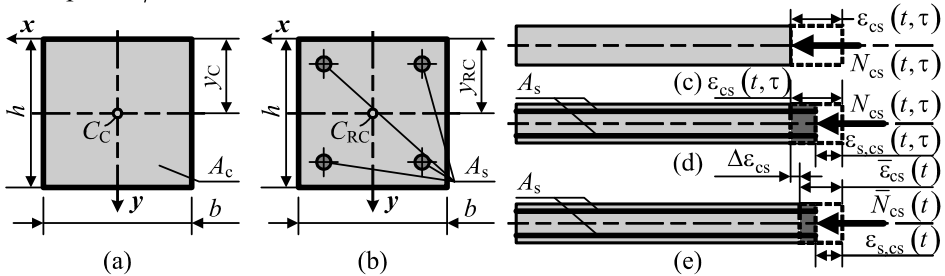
Deformations of symmetrically reinforced concrete member due to shrinkage: plain concrete section (a); reinforced section (b); modelling of free shrinkage deformation (c); deformations due to restrained shrinkage neglecting and taking into consideration creep effect (d) and (e), respectively
